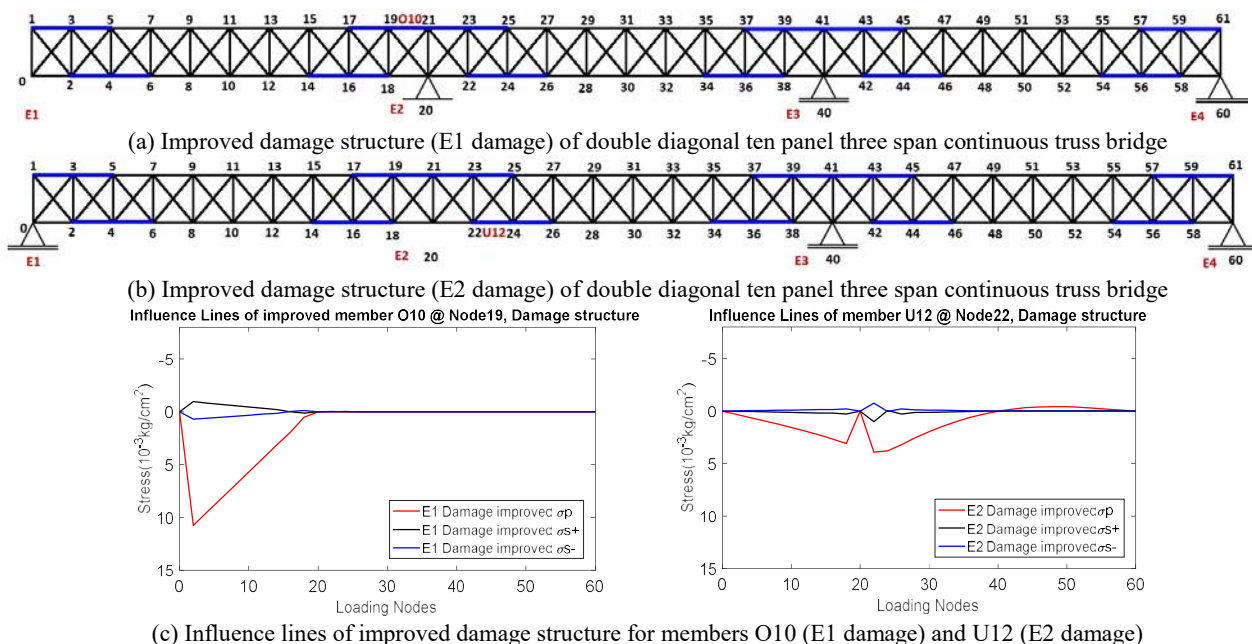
Influence lines of improved damage structure for members O10 and U12 in ten panel three span continuous truss bridge
